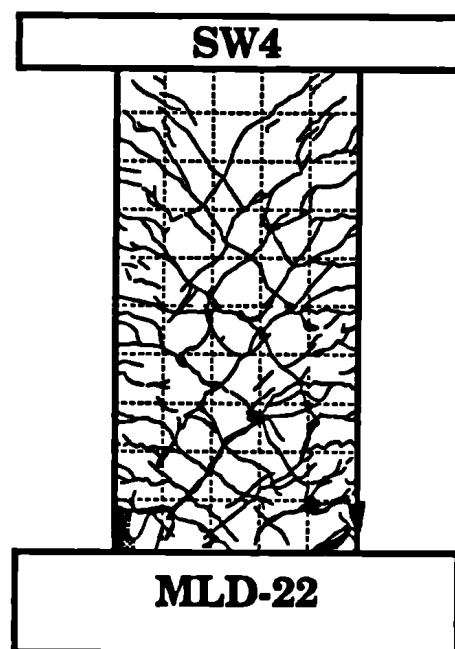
PilaSW4: DS4a - cracks at MDL-22 (core crushing)
